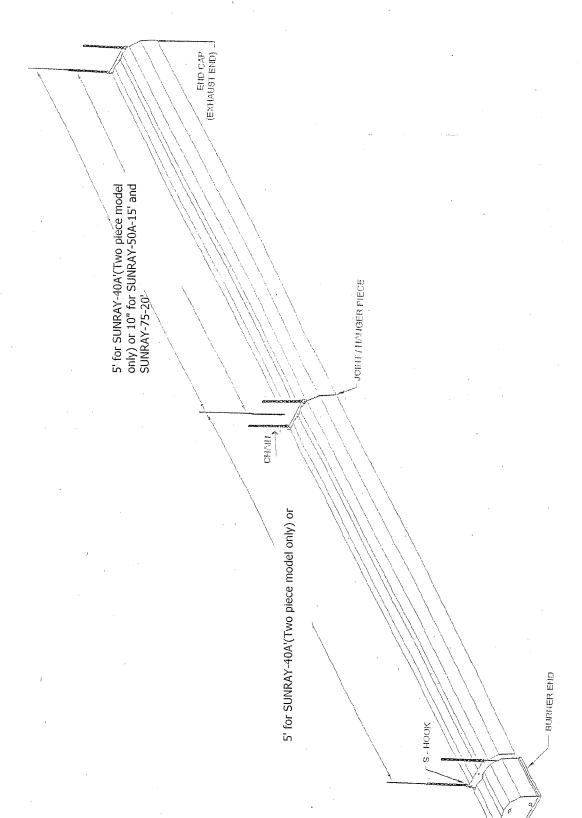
HORIZONTAL INSTALLATIONS SUNRAY-40A-10' TWO PIECE, SUNRAY-50A-15' AND SUNRAY-75A-20'
